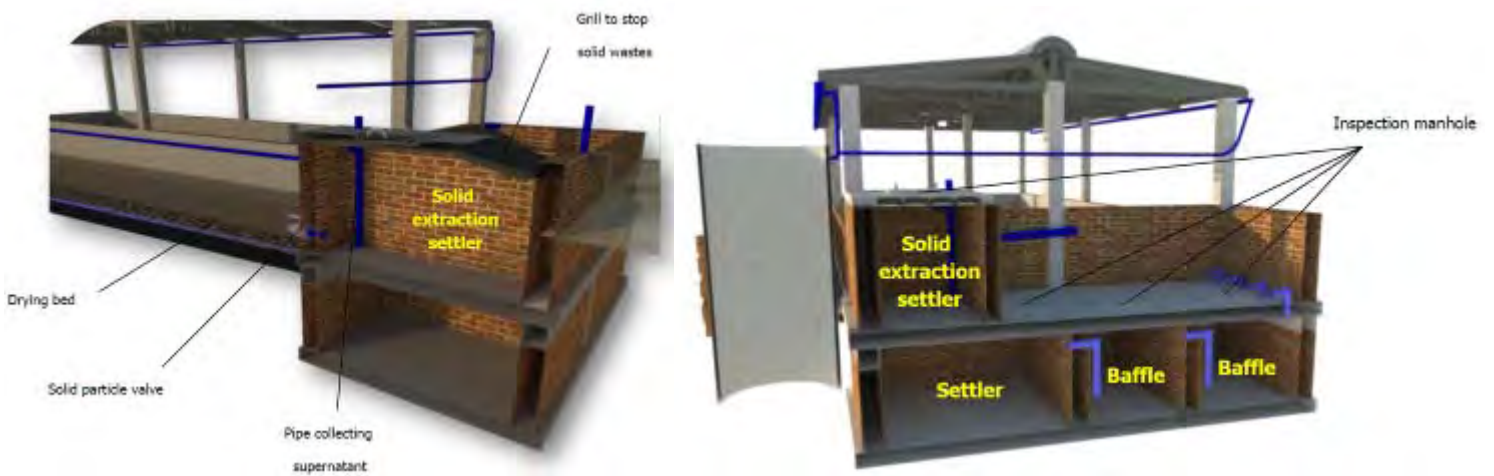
Cross-sections of the two-story treatment plant. On the left, the solid extraction settler, its raised effluent pipe, its sludge discharge valve, its inlet screen, and the first chamber of the ABR underneath, as well as the adjacent SDB, are visible. On the right, the rainwater collection tank, solid extraction settler, 3-chamber ABR, aerobic pond, and the 3 inspection manholes are visible.
